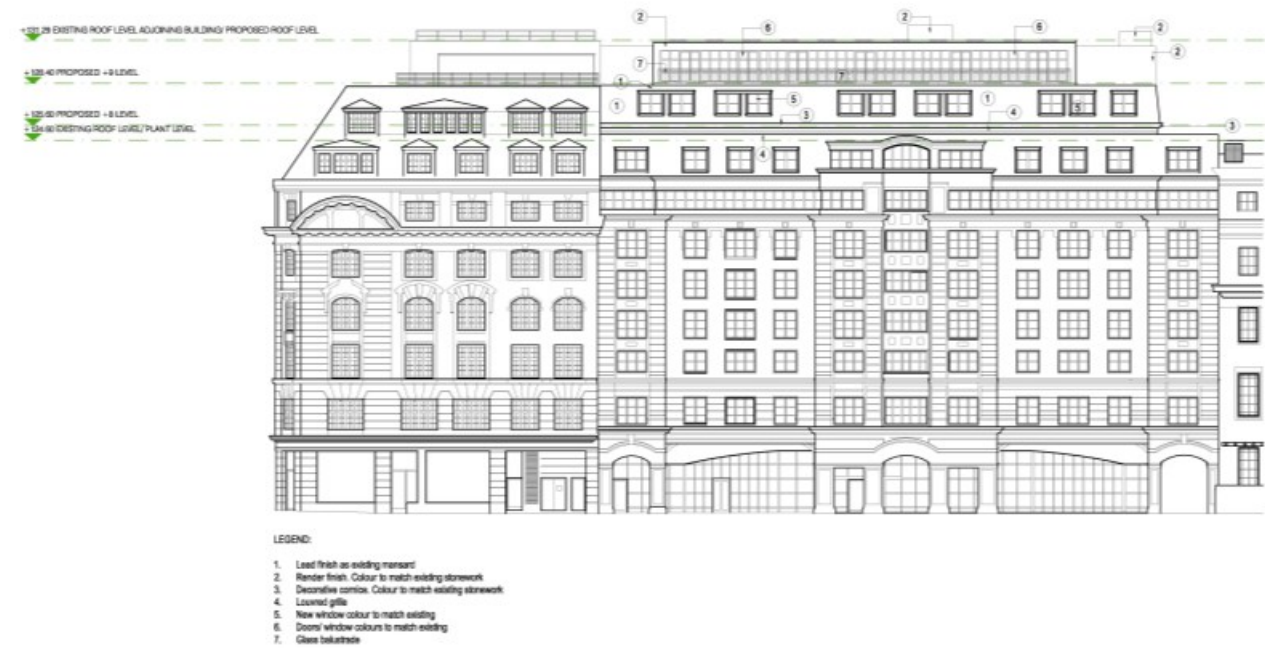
View of the proposed elevation of the Kingsway Hall Hotel, with the proposed ninth and tenth storey extensions shown.
